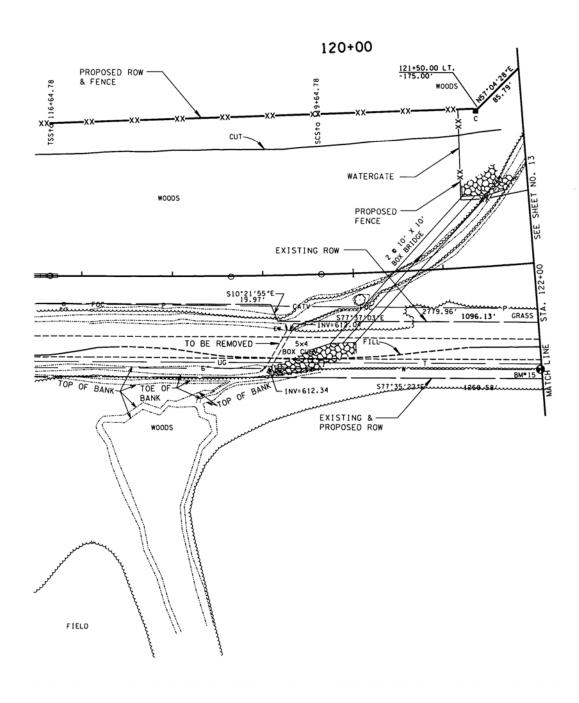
A-5. Portion of Present Layout Sheet (Box Bridge)
